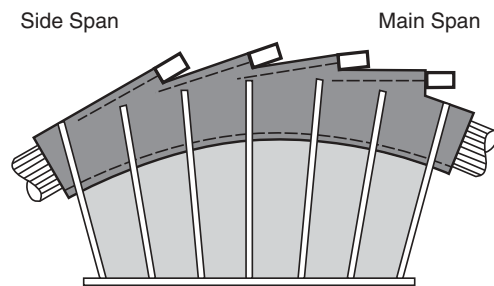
Cable saddle with a cast steel saddle groove and a welded bottom part
